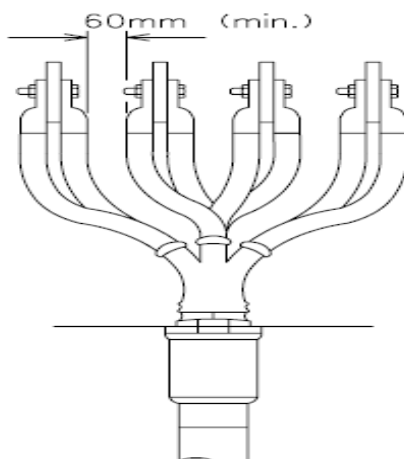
Correct connection of back-to-back LV cable onto a bushing flag
